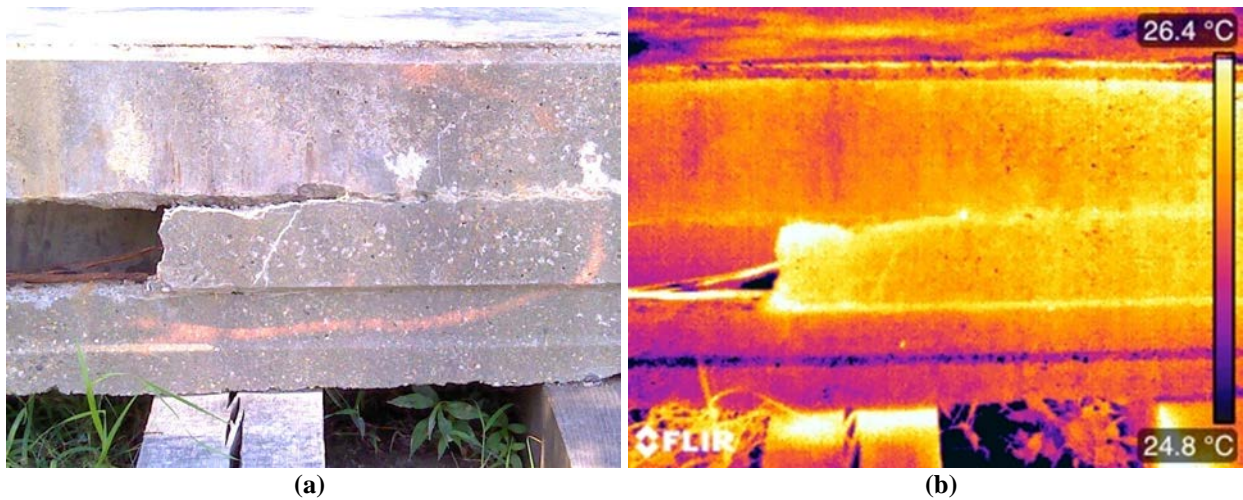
Comparison of (a) Digital Camera and (b) Infrared Camera Images of Spalled Concrete and Exposed Prestressing Strand and Structural Void in Fascia Beam From Qualla Road Bridge
